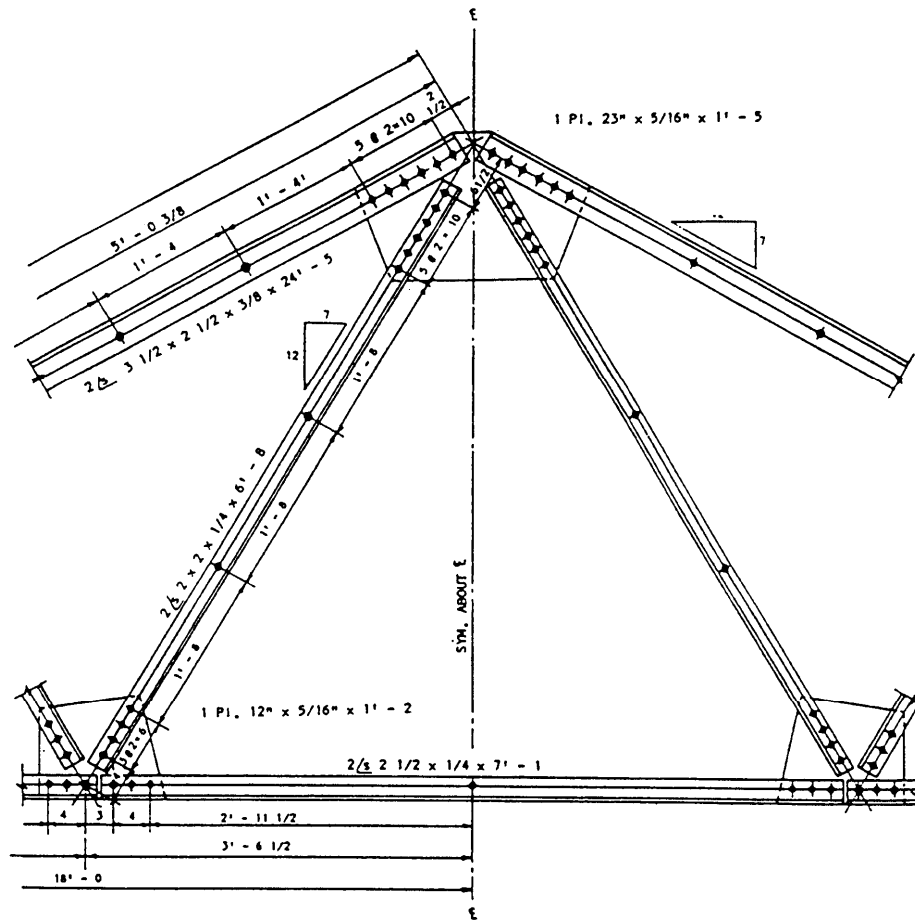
Steel truss fabricated from angle-shaped members.
